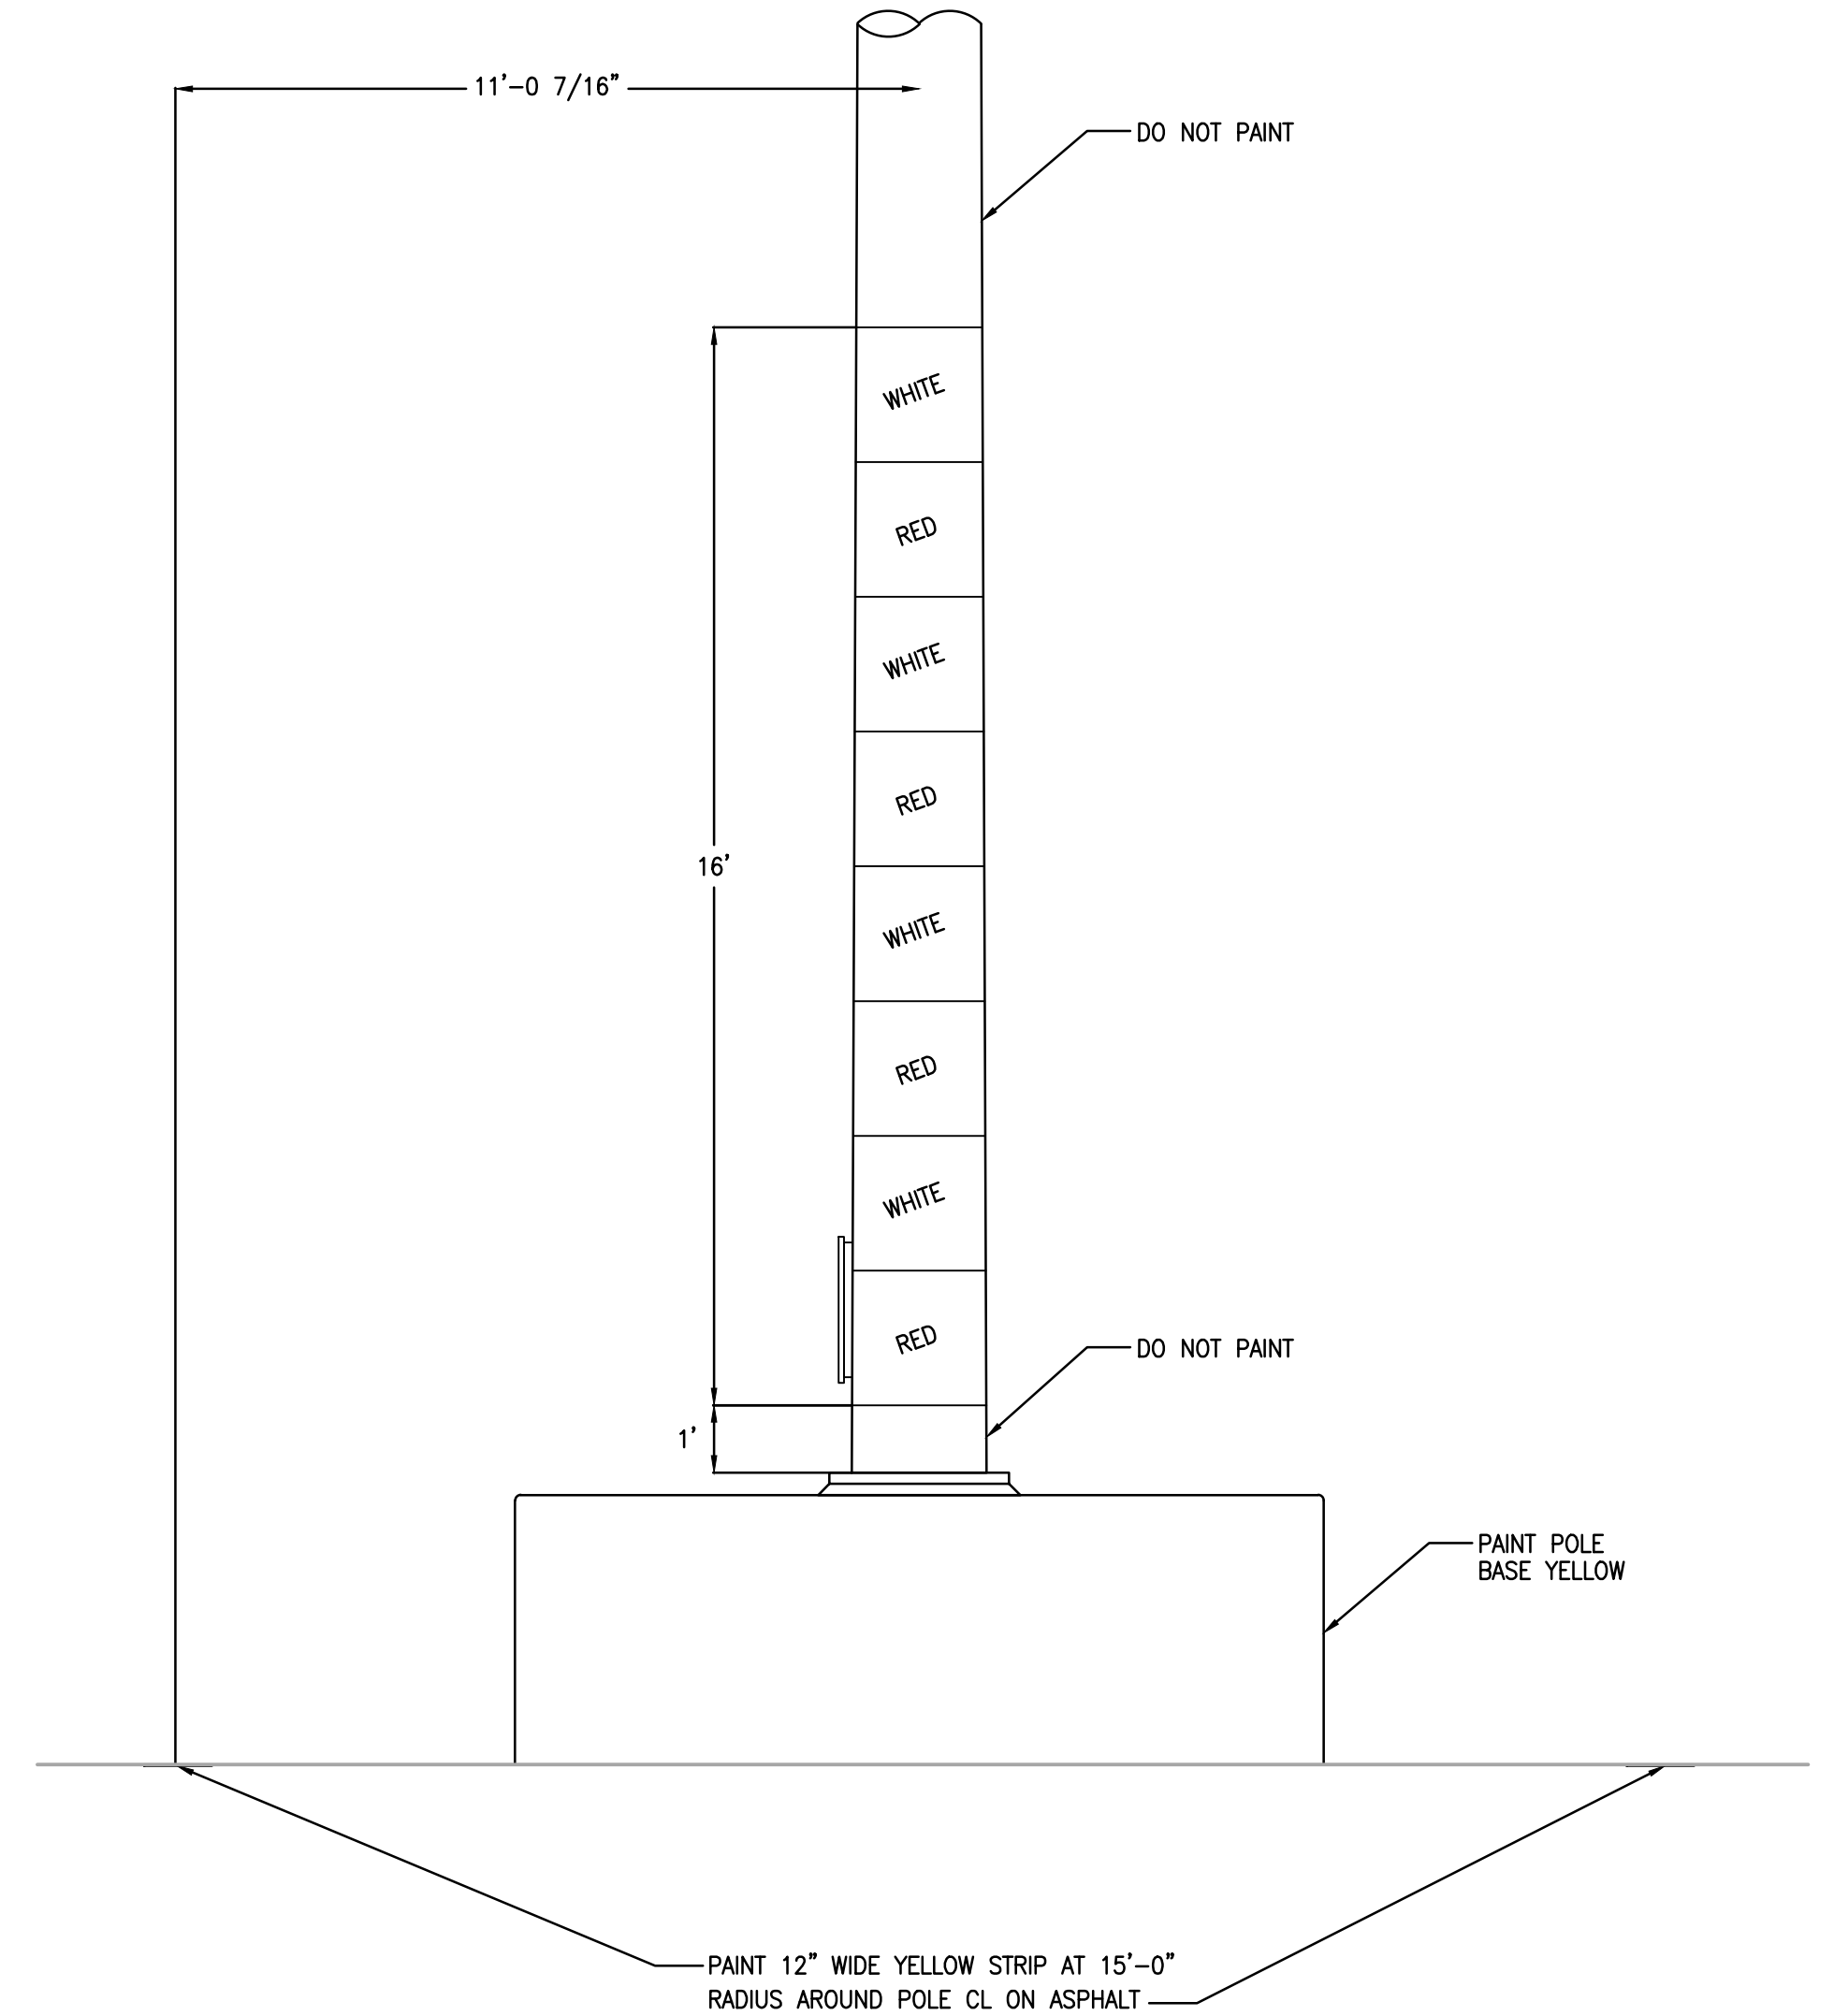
DETAIL - TYPICAL HIGH MAST LIGHT POLE 1
